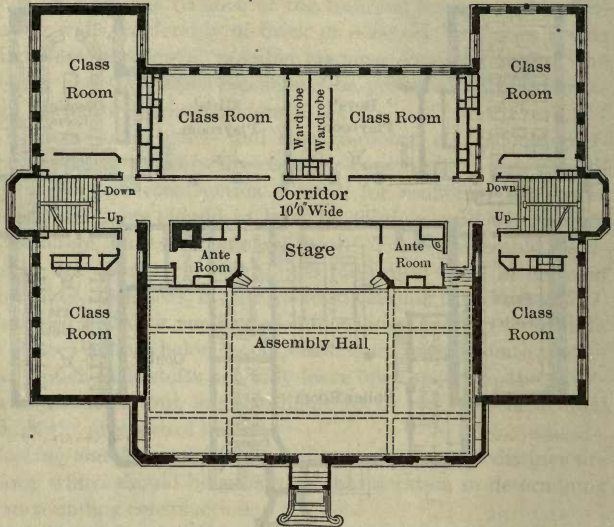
First Floor Plan, Lyman District School, East Boston.
